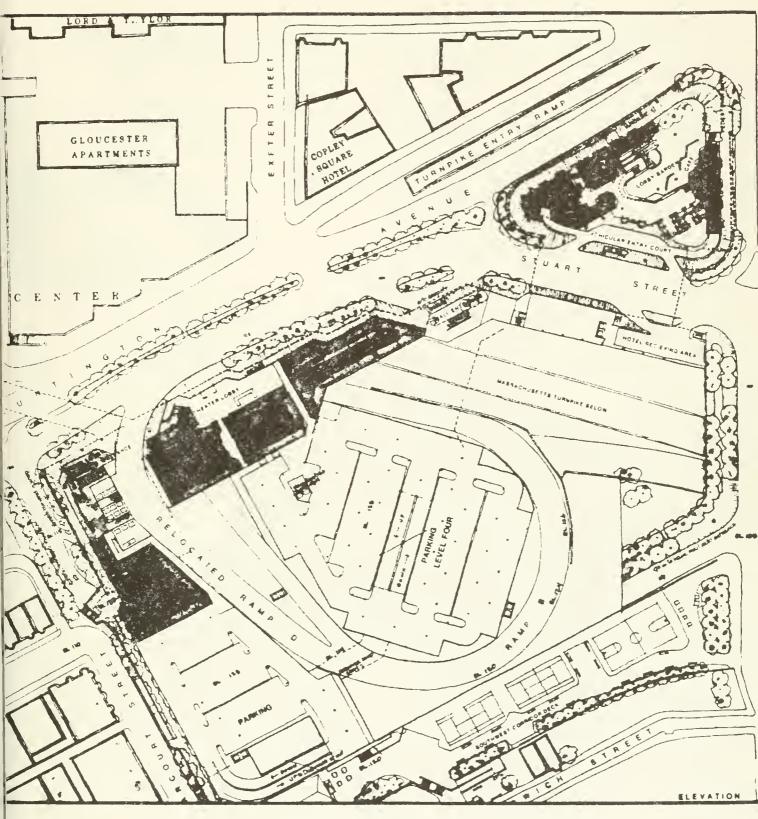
EARLY CONCEPT SKETCH, ELEVATION 125
